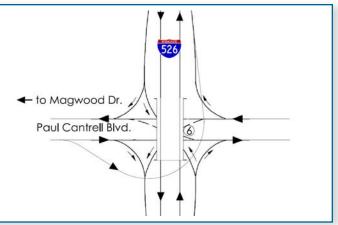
I-526 at Paul Cantrell Blvd Alternative 4
